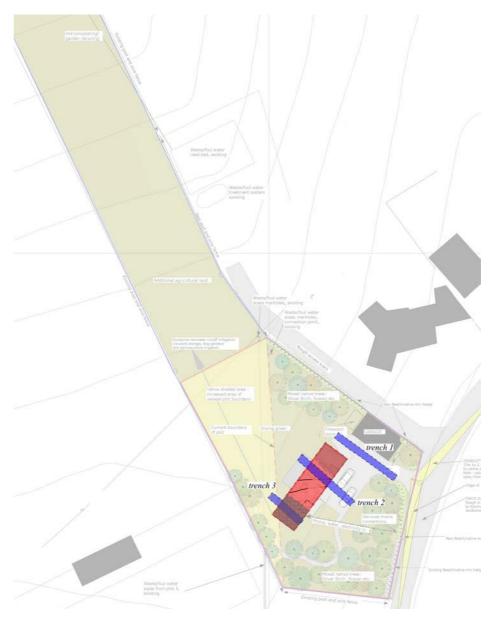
Trench plan, trench numbers run sequentially with trench 1at the top (indicated in blue)
